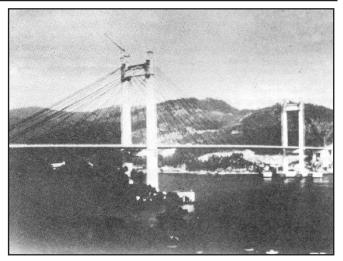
Rande Bridge, Spain. The main cable-stayed span has 400-m length, with two portal-shaped reinforced concrete towers
